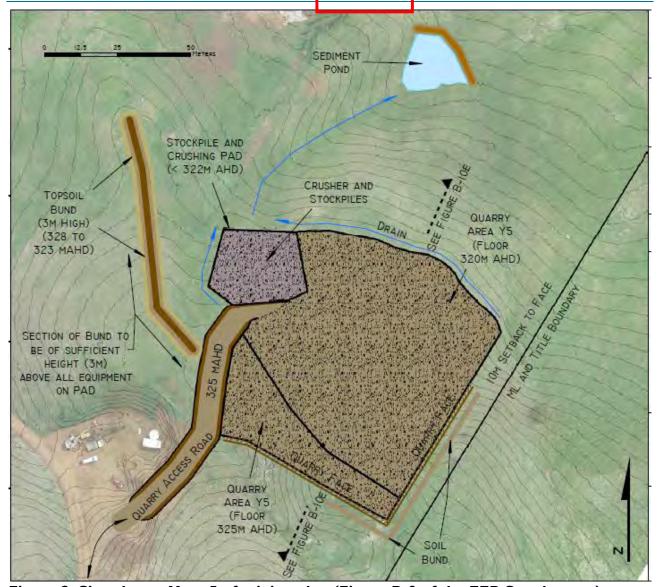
Site plan to Year 5 of mining plan (Figure B-9 of the EER Supplement)
